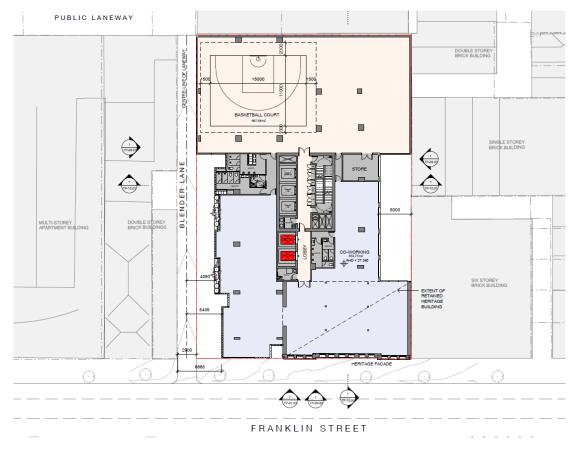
Level 2 floor plan showing basketball court at rear (Source: Applicant)
